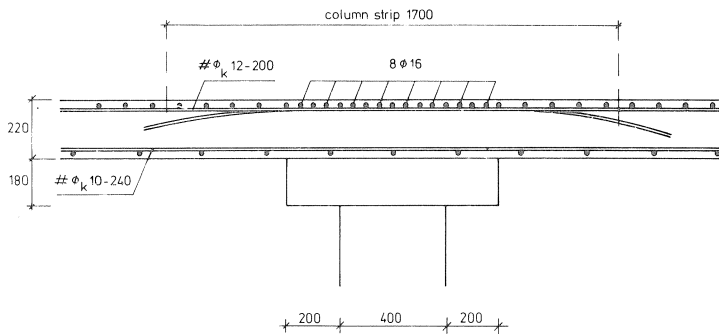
Prestressing and normal reinforcement in slab to column connection.
